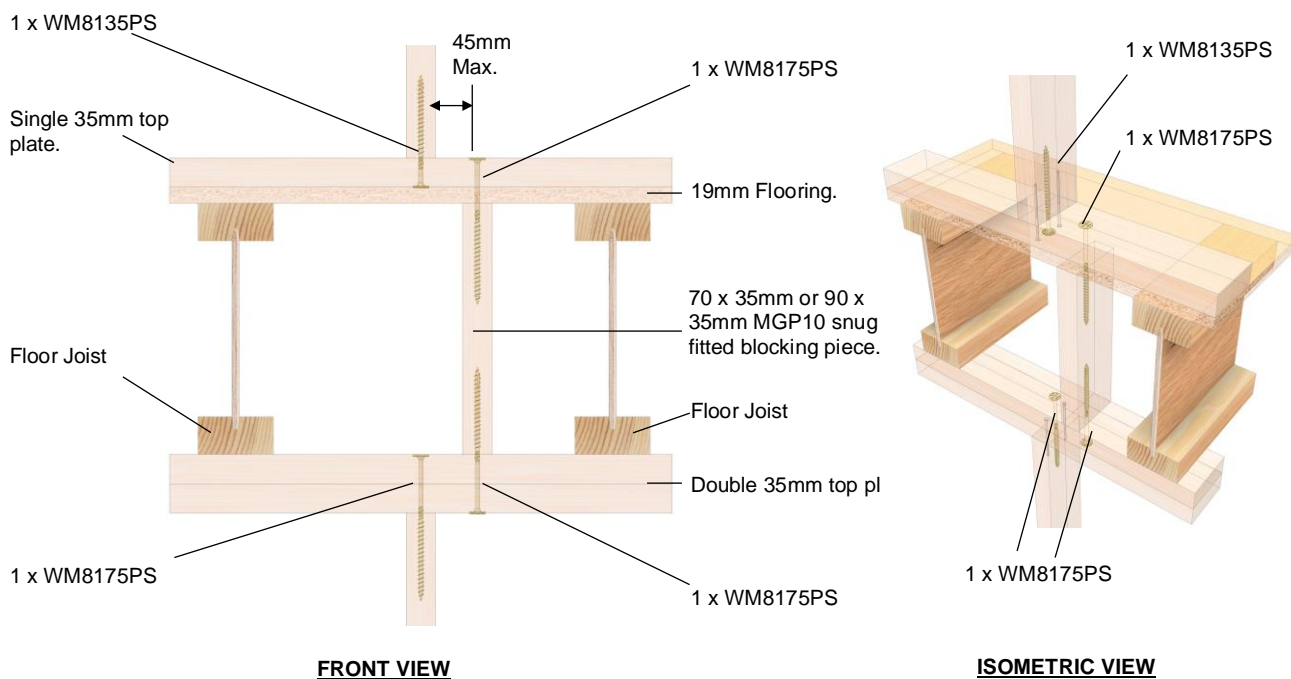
BETWEEN FLOOR JOISTS – CONTINUITY BLOCKING
